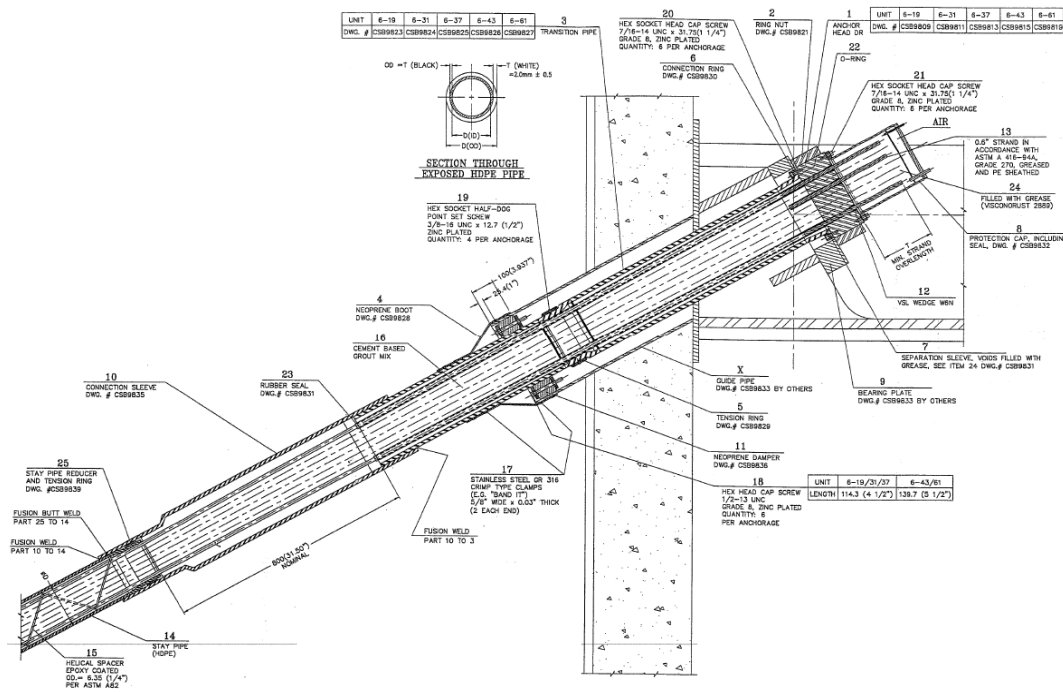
Tower Anchorage Sectional View Showing Key Components (VSL).
